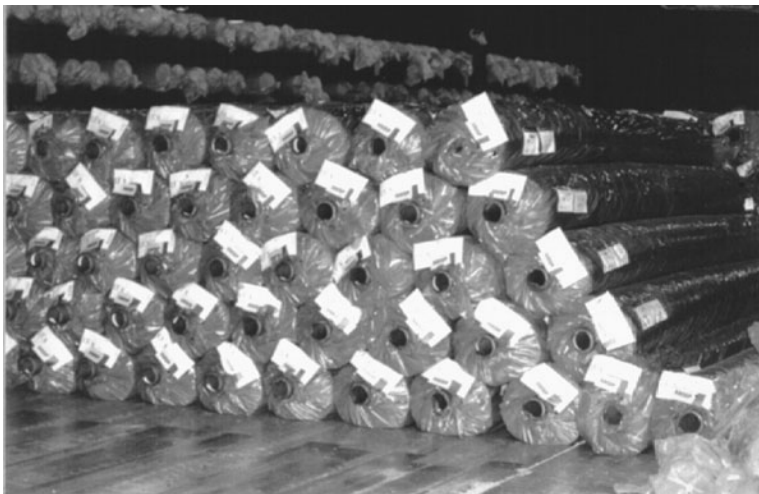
Indoor Factory Storage of GCLs Waiting for Shipment to a Job Site.
